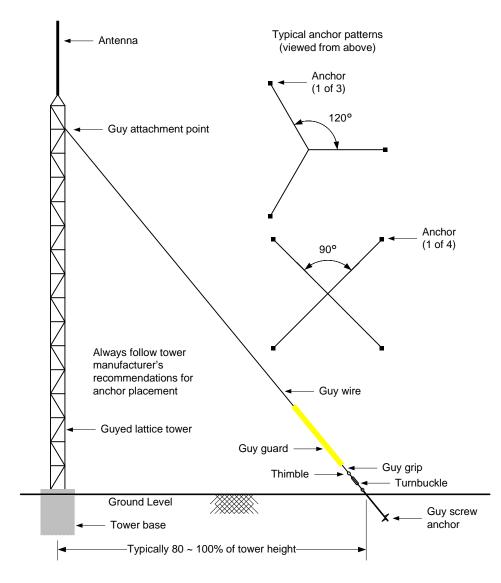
~ Tower guy anchors. A typical guyed tower uses three or four anchors.
